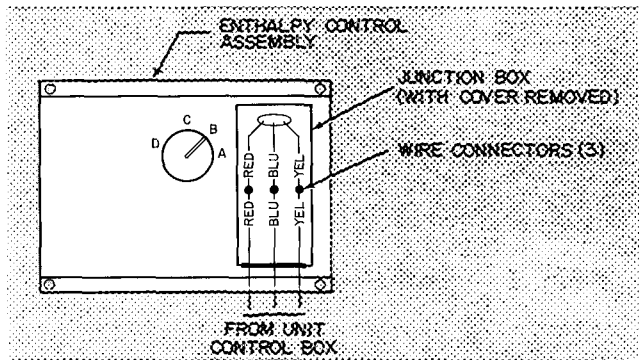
Enthalpy Control Assembly Wiring Connections
